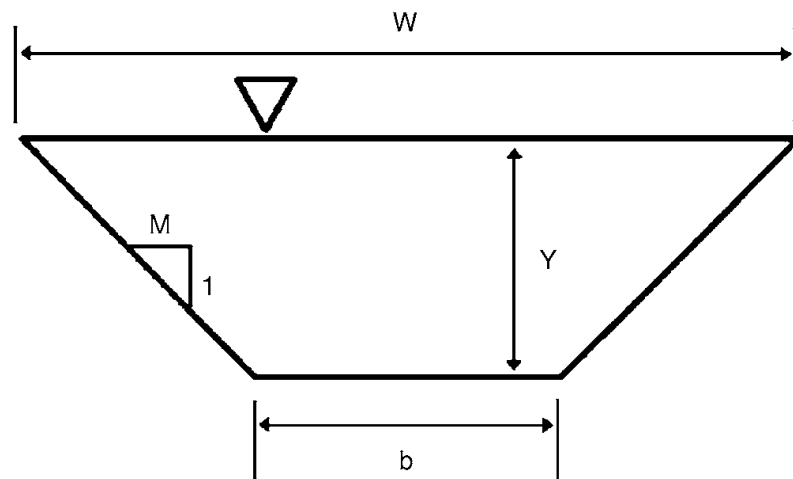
Cross-section of a trapezoidal channel - definition of variables (CRC, 2001).
